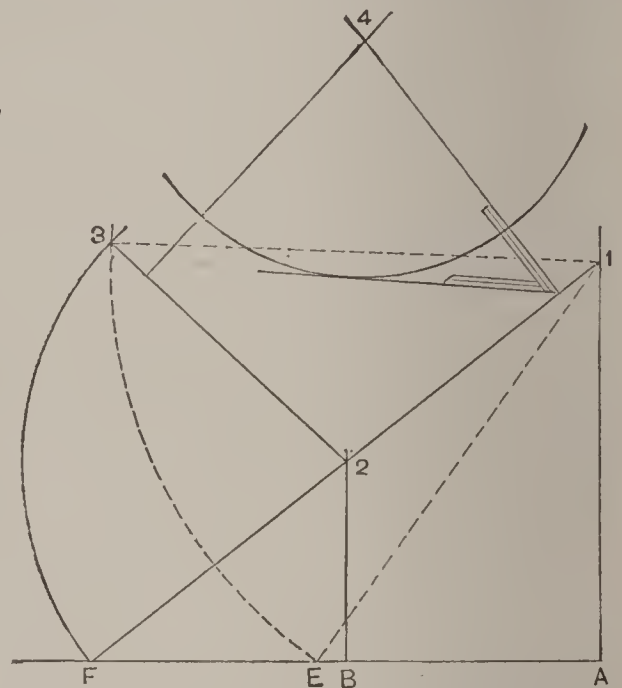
ELEVATION, BEVEL, TANGENTS OF ONE PITCH, TO COVER GROUND PLAN OF FIG. 155.
